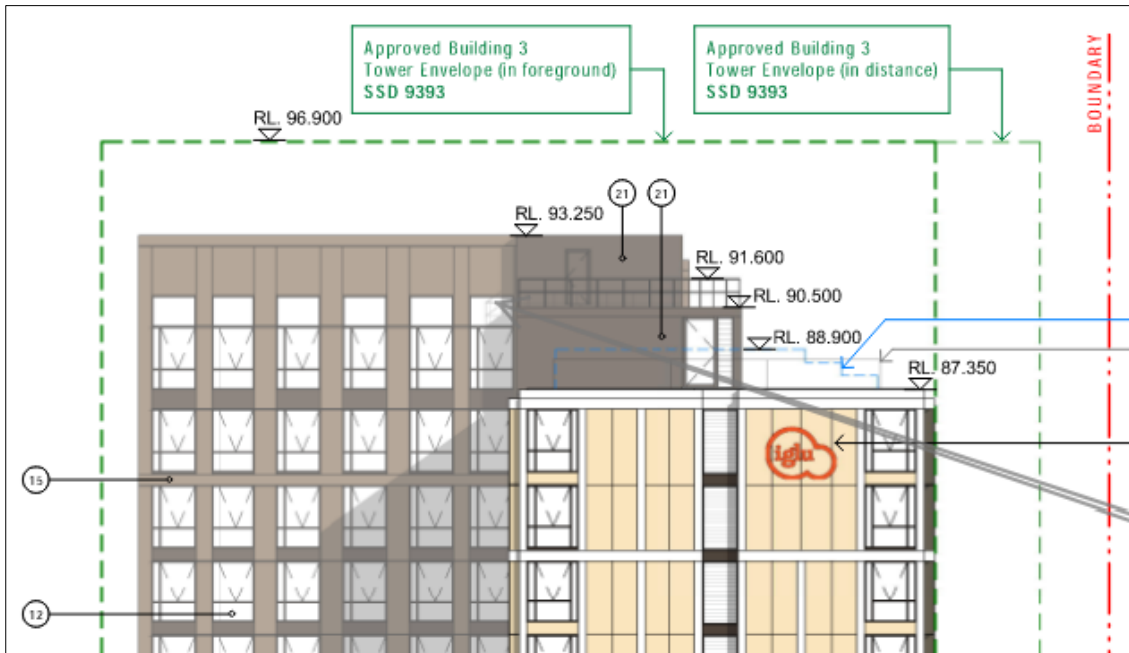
Proposed Amended Plan: North Elevation: DWG140 Rev I (additional height in green)
